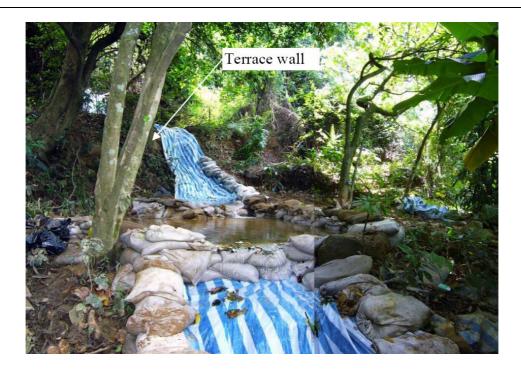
Debris Trail: Looking Upslope to Terrace Wall (Photograph taken on 29 August 2005)
